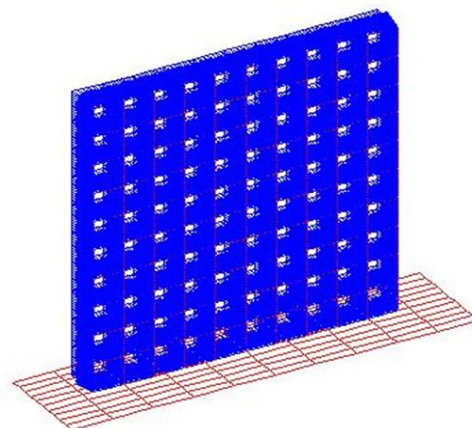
Loading diagram of CFRP two-way Hollow core shear wall with Channel shaped boundary elements
